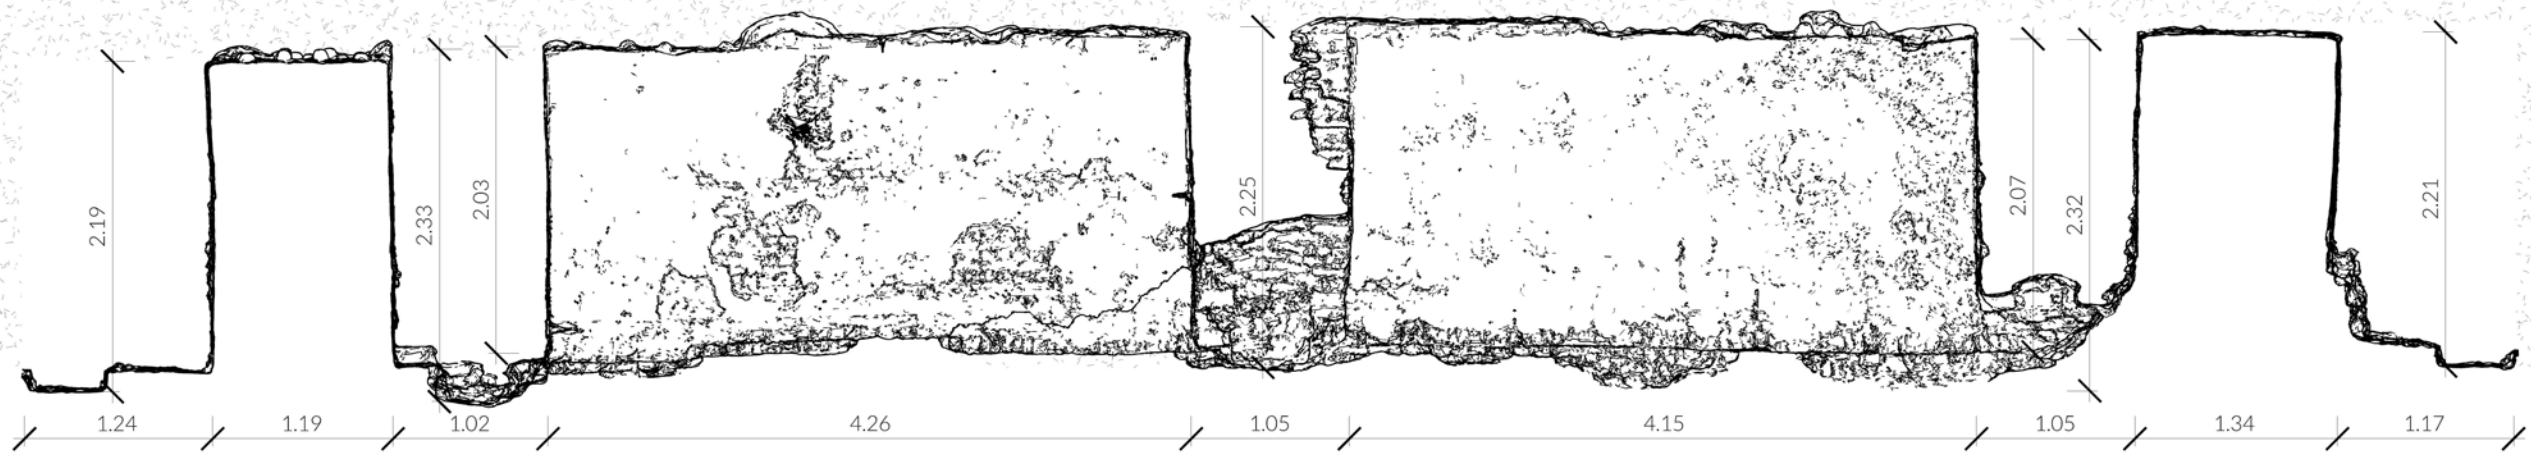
Section through YKK6 - YKK7 - YKK8 - YKK1, north walls, 1:50
